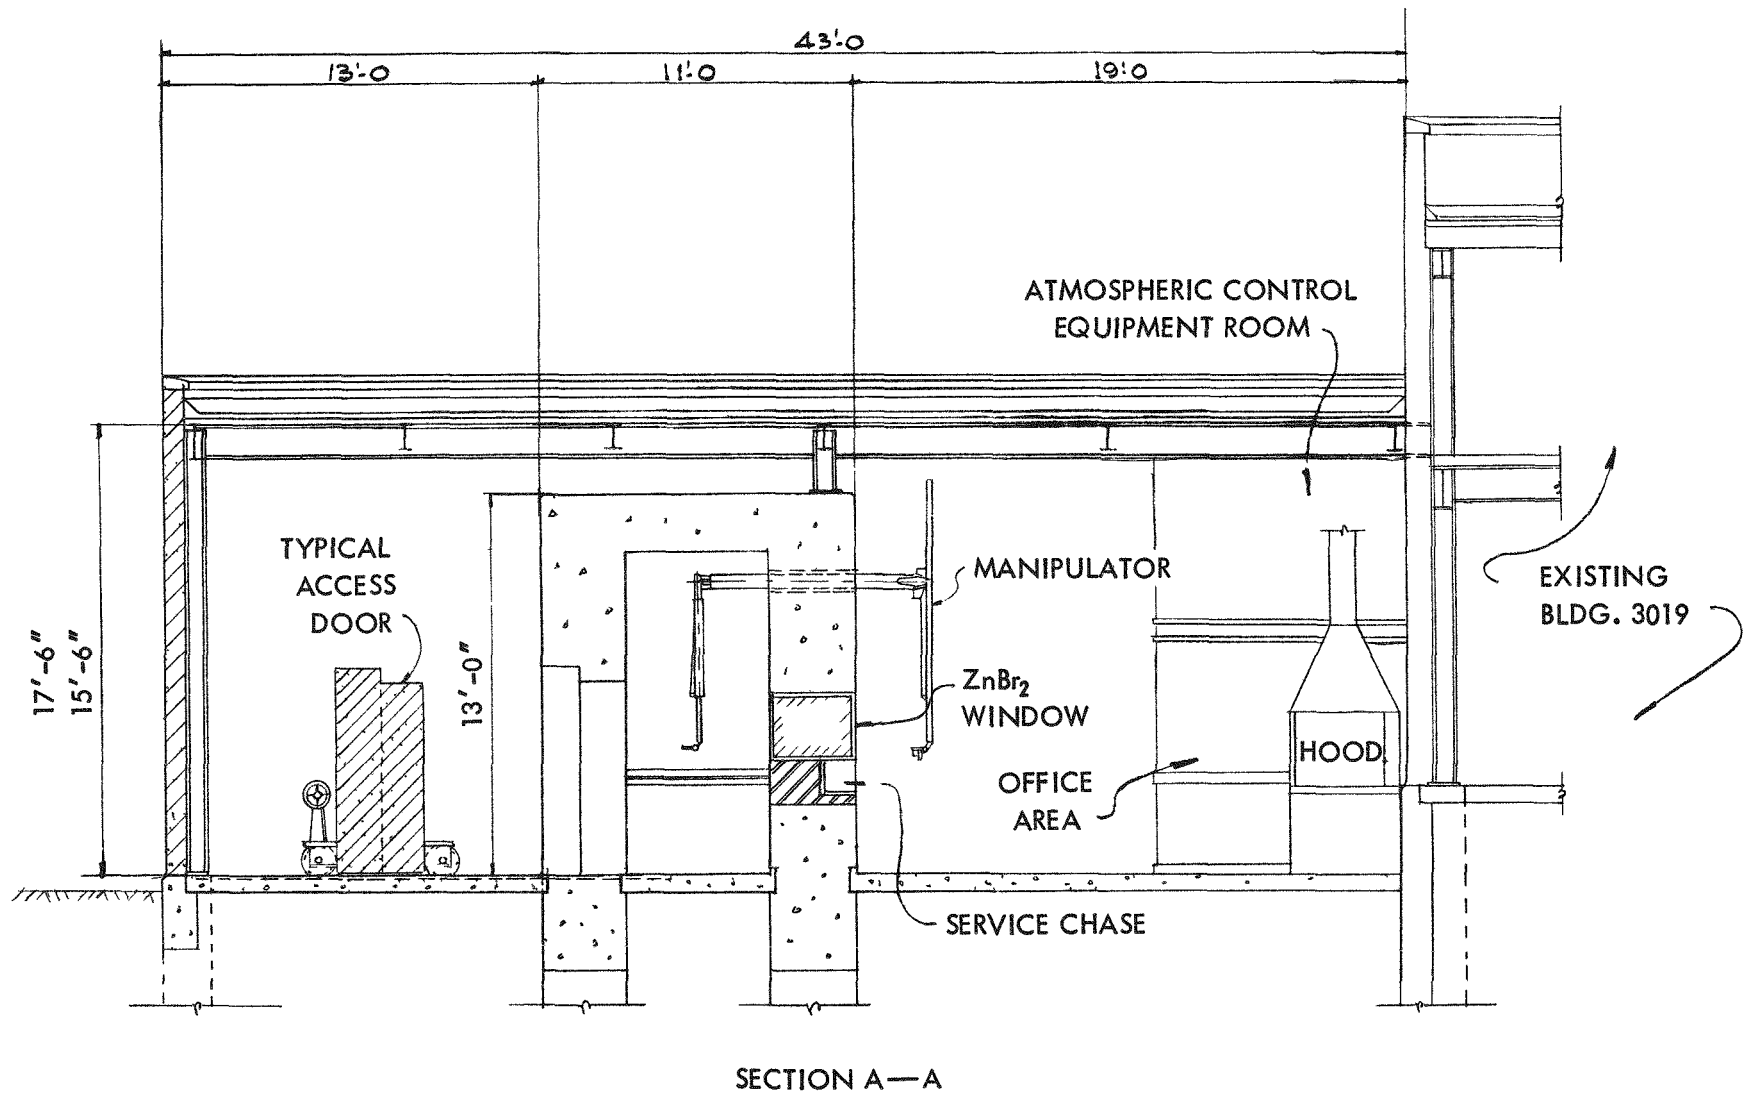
Vertical section of high-radiation-level analytical facility, Chemical Processing Pilot Plant, building 3019, Oak Ridge.
